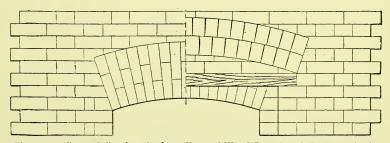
Gauged Camber Arch on Face of Wood Lintel and Common Arch.
